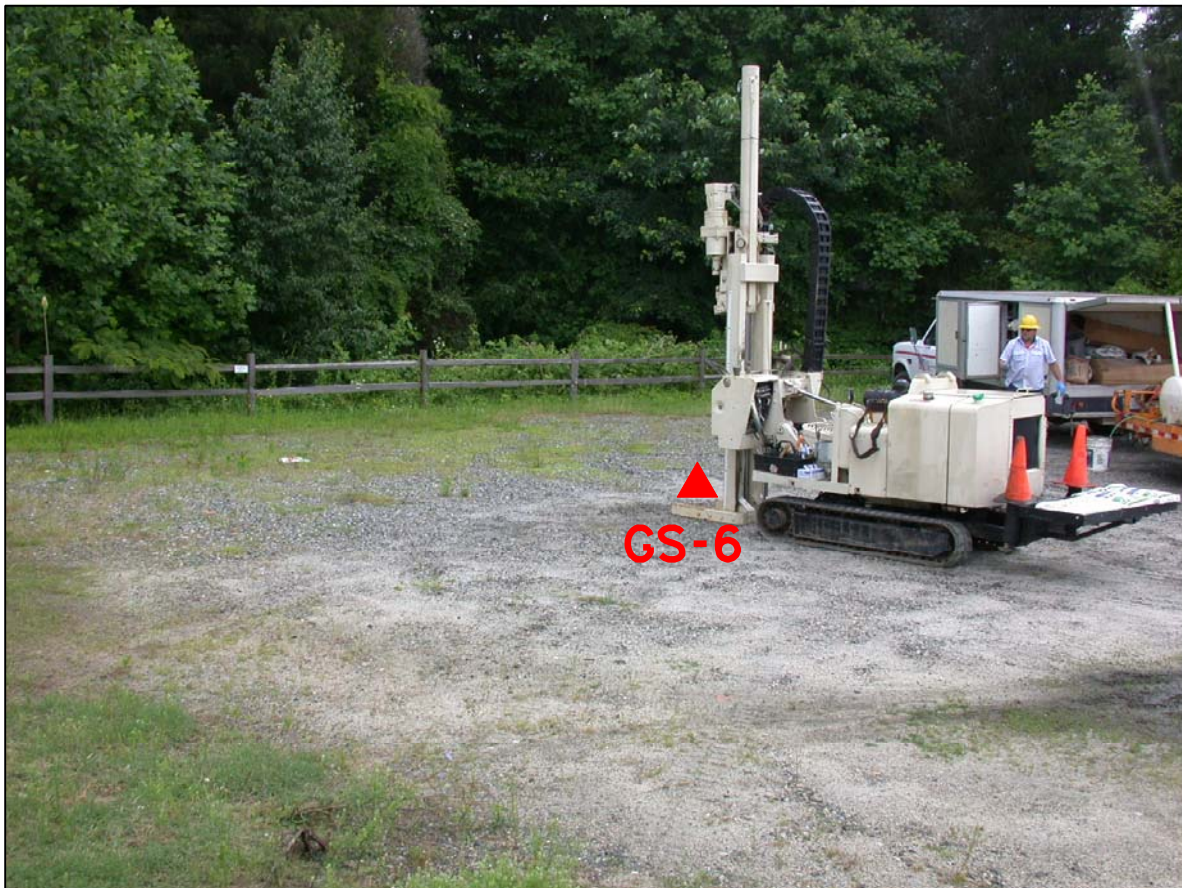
BORING WITHIN PROPOSED R/W LOOKING SOUTHEAST
